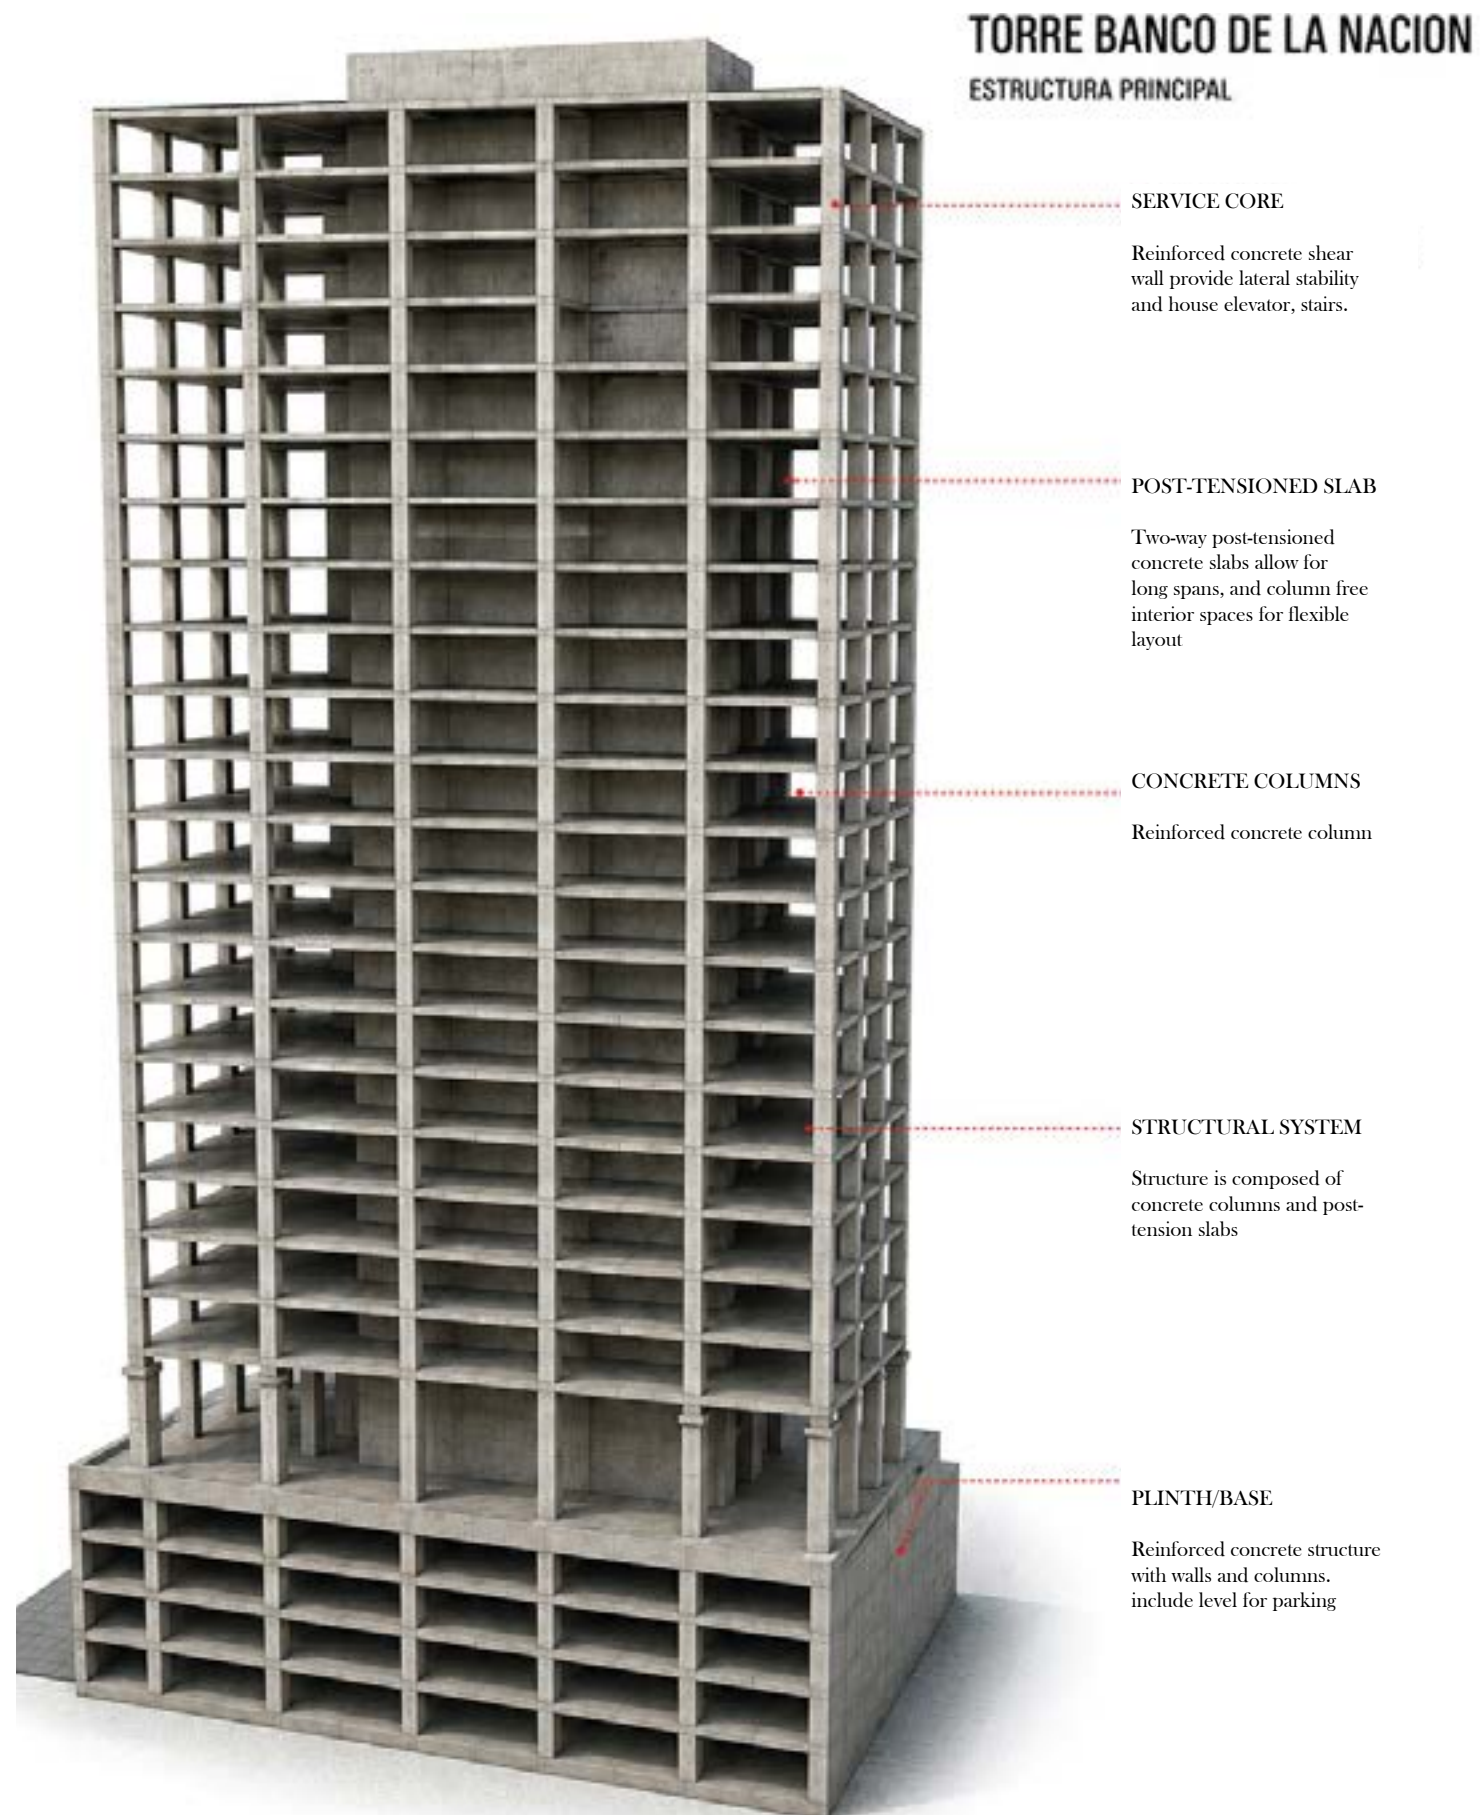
Structural system of Torre Banco de la Nación, illustrating the reinforced concrete core, post-tensioned slabs, concrete columns, and podium structure. Source: Diagram by the author.
